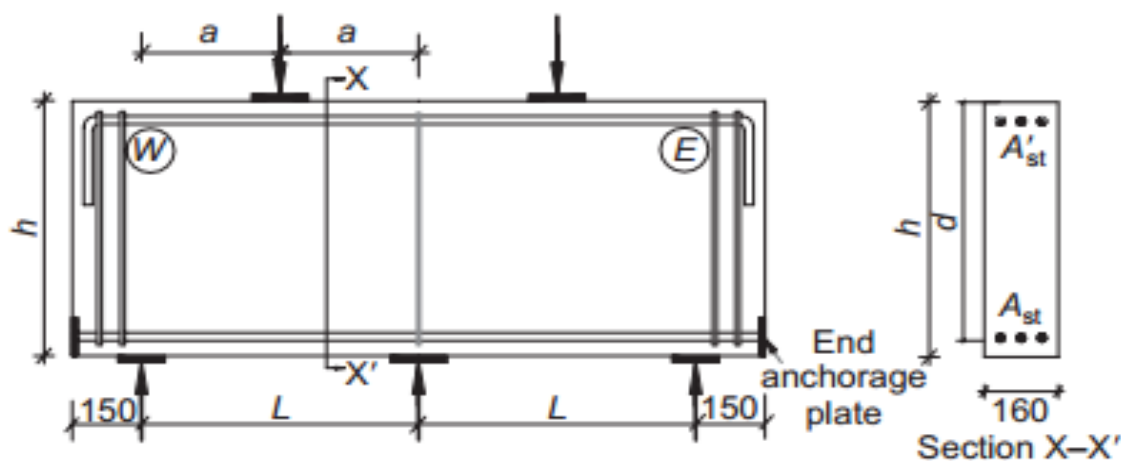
Details of beam geometry and arrangement of reinforcements (Yang, and Ashour, 2007)
